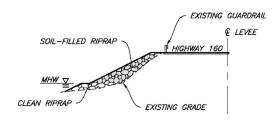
Typical Cross Section III, Sta. 875+00 - 990+00
